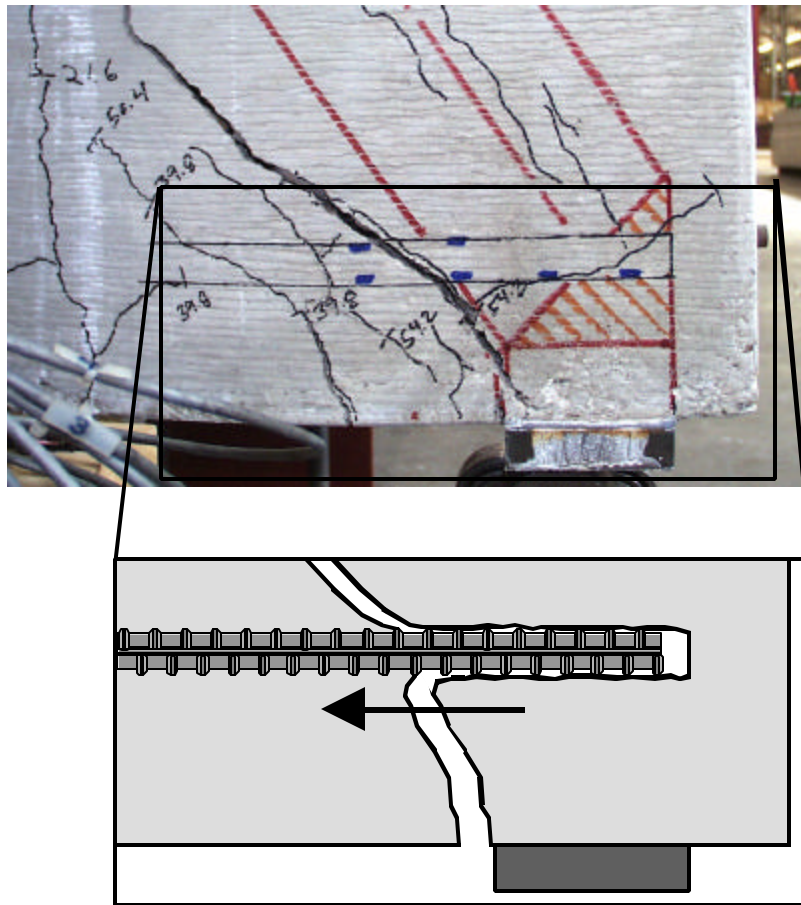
Pullout failure of a non-headed bar (specimen CCT-08-55-00.00-1)
